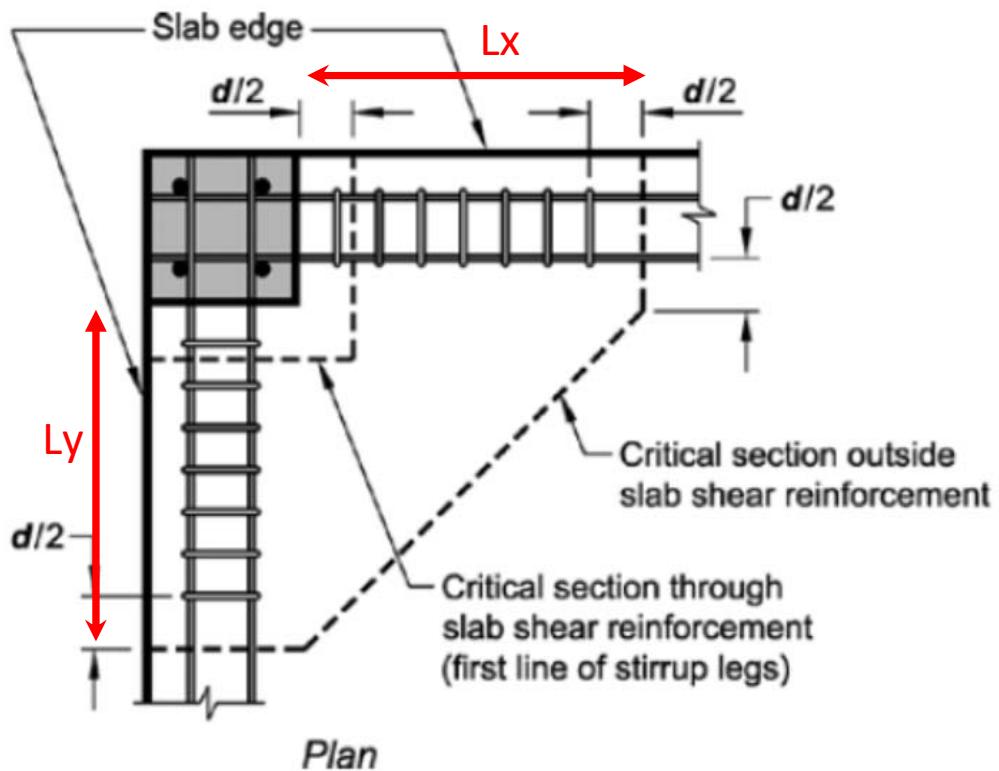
Critical sections for two-way shear in slab with shear reinforcement at corner column.
